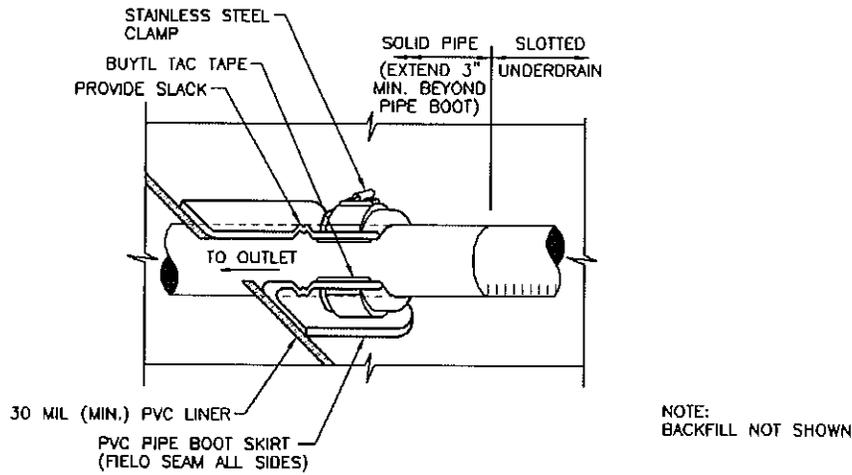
Geomembrane Liner/Underdrain Penetration Detail
